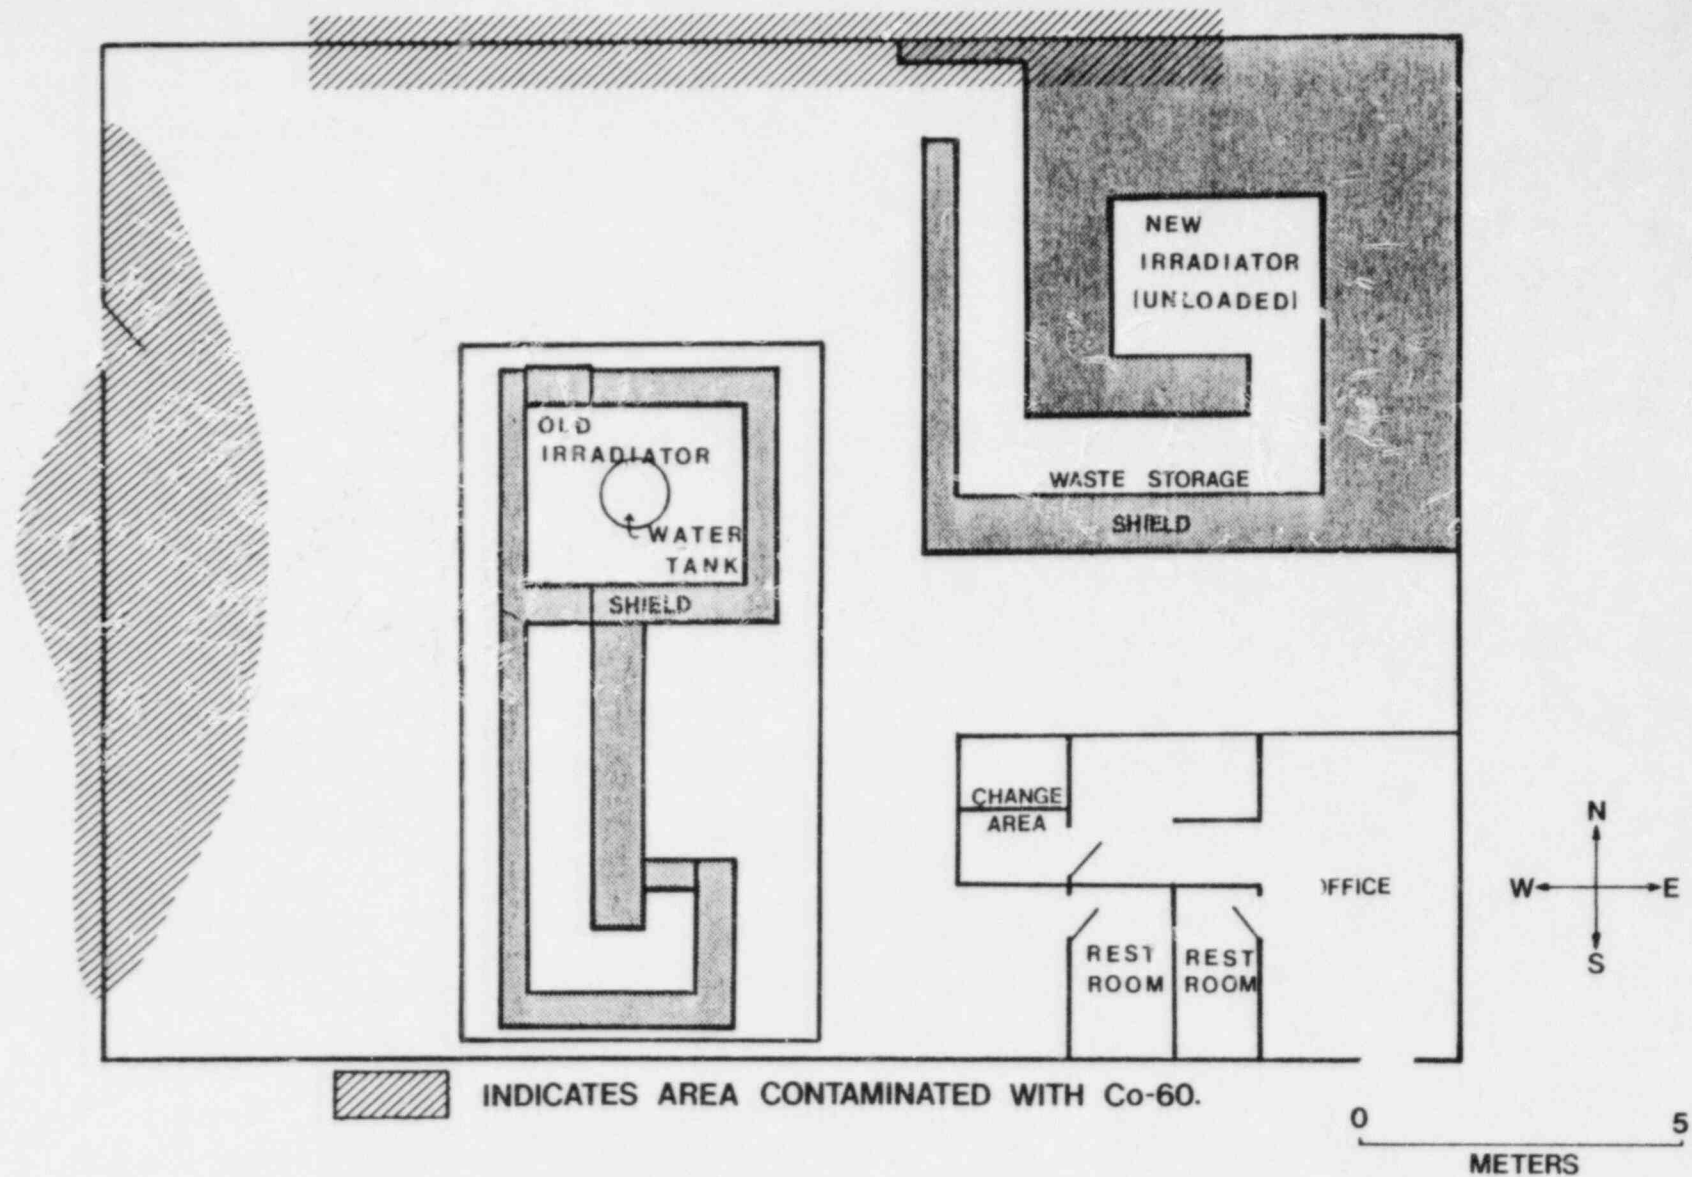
Floor Plan of the Irradiator Building, Indicating Areas of Subfloor and Outside Soil Contamination.
